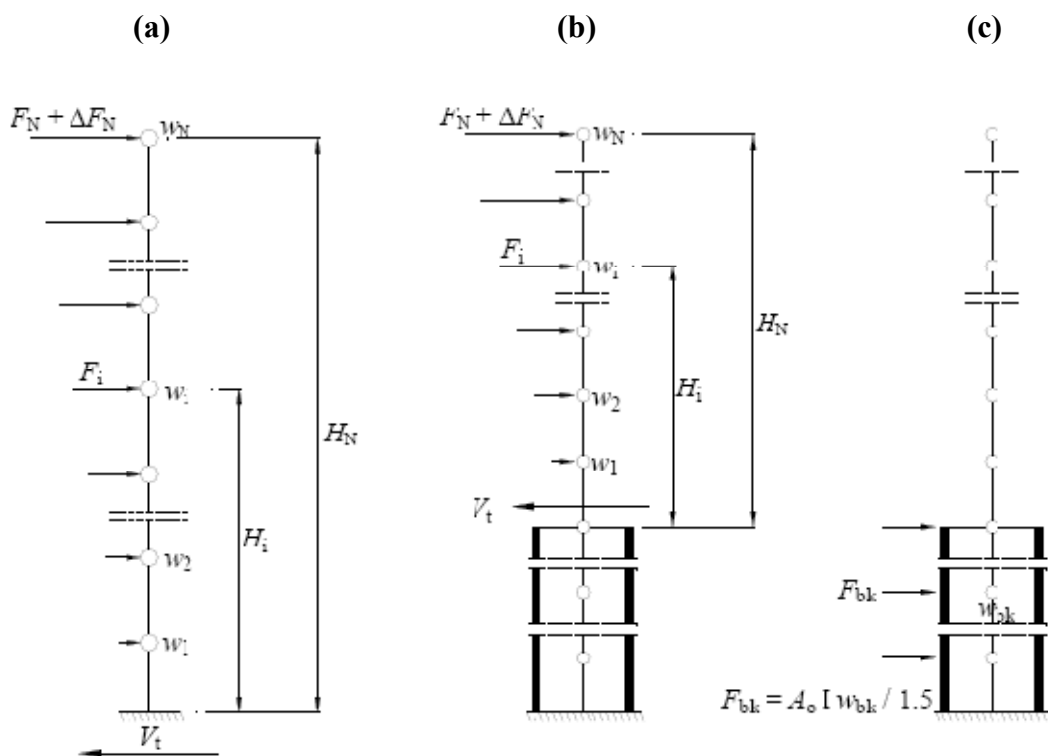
Design Seismic Loads Acting at Storey Levels
